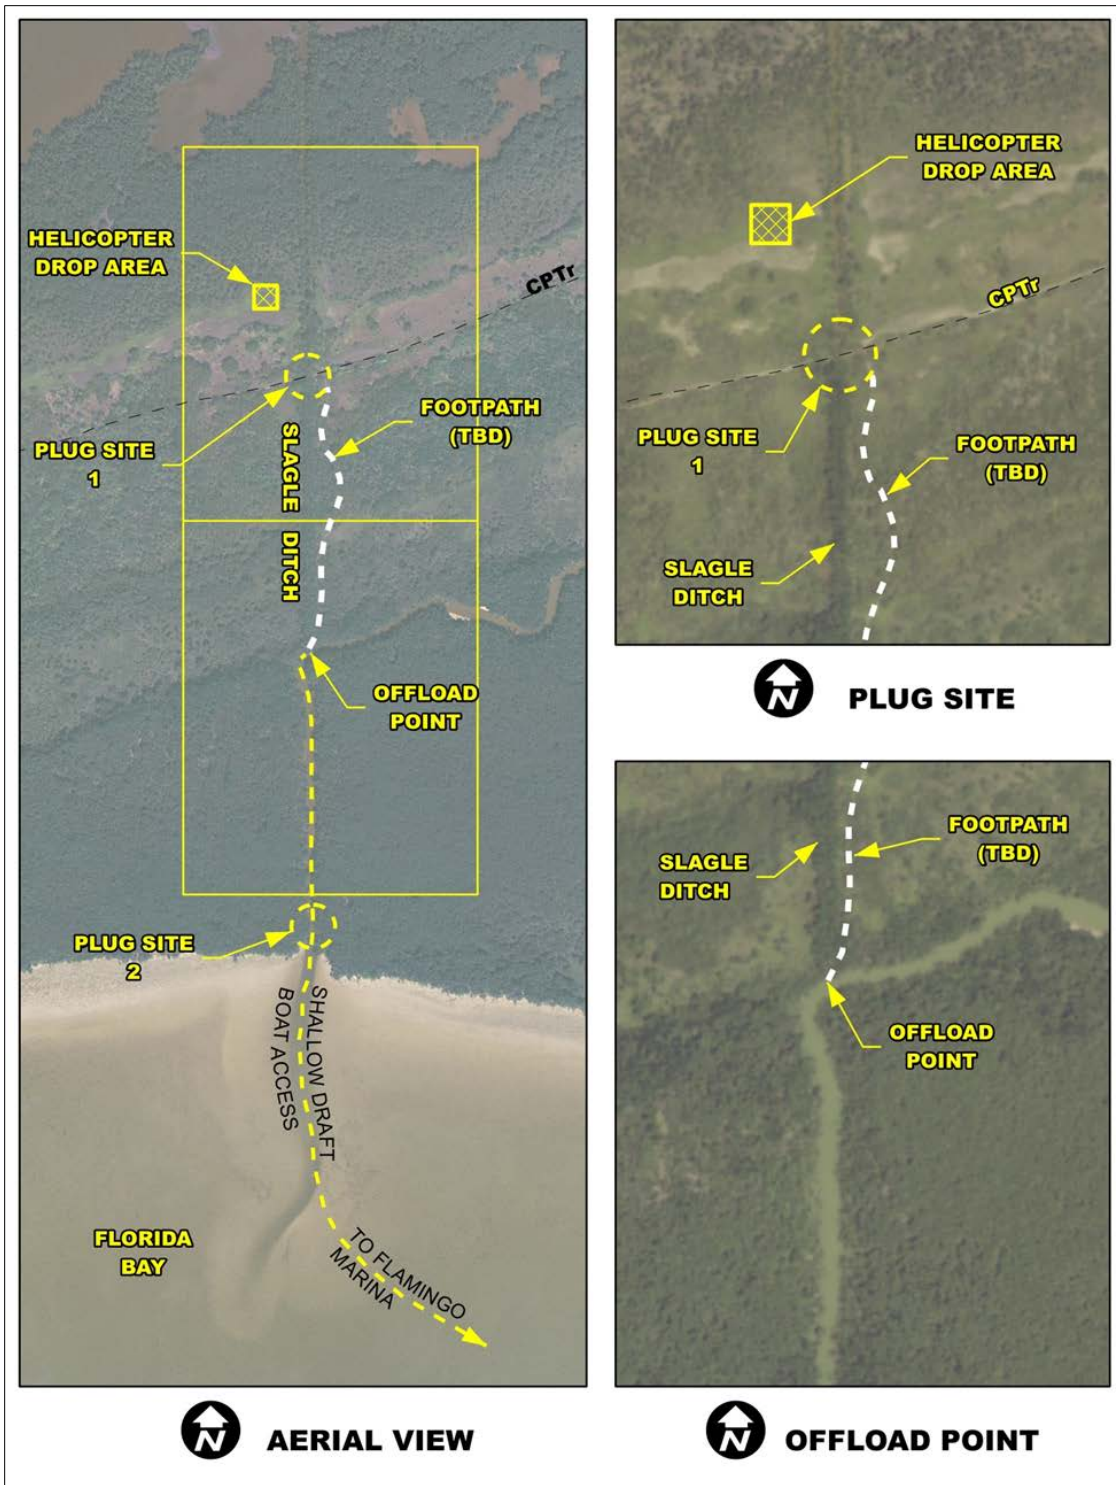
SLAGLE DITCH PROJECT SITE
